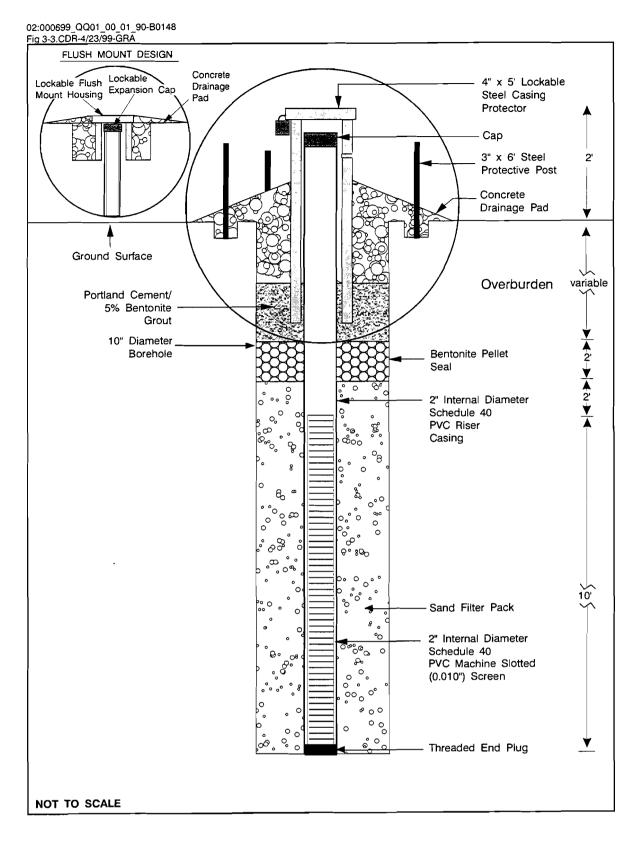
PROPOSED CONSTRUCTION FOR SHALLOW OVERBURDEN MONITORING WELLS
